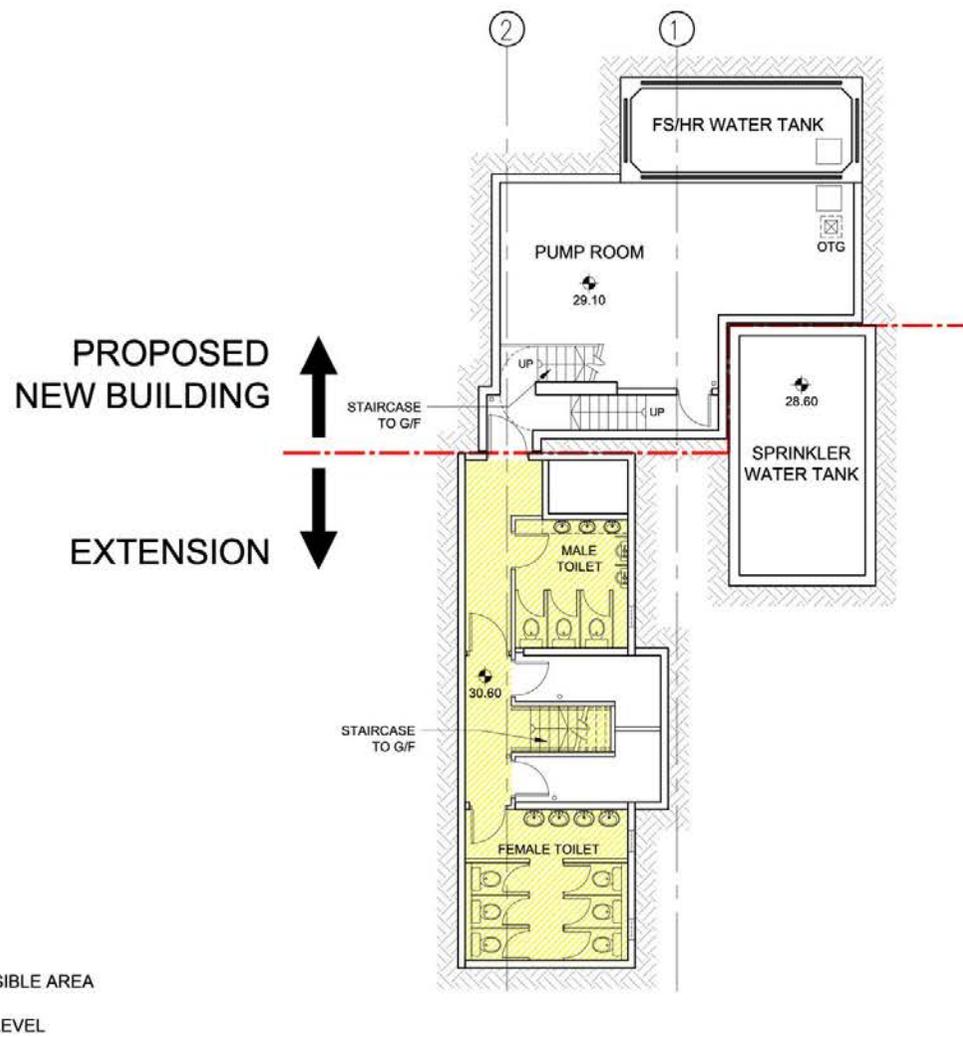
Lower G/F plan (not to scale).
